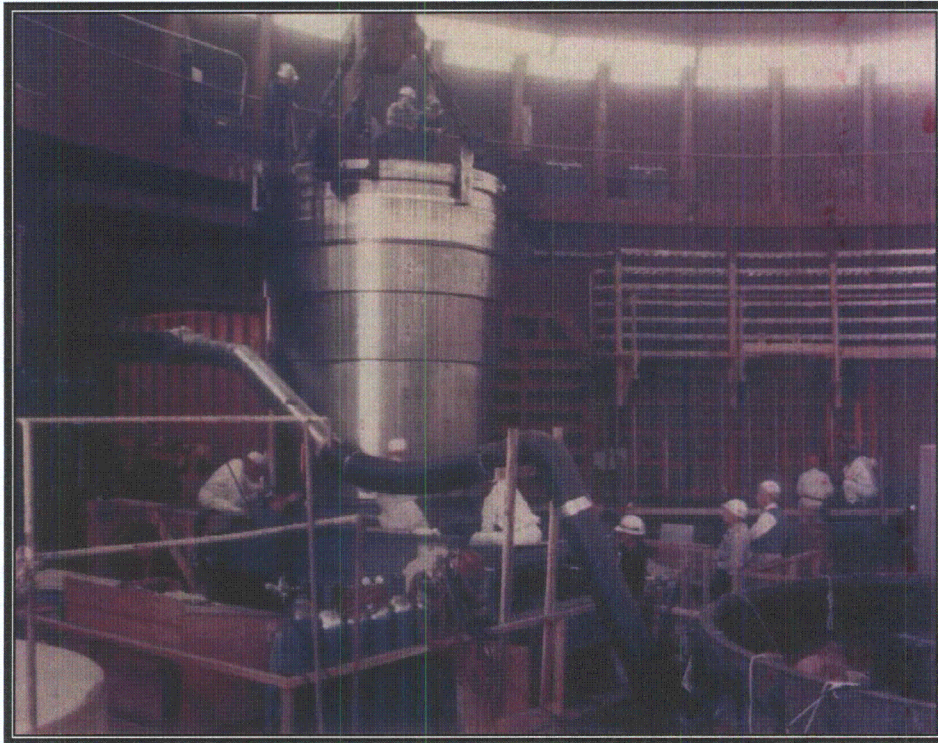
Installation of rotating shield plug (Courtesy DECo)
